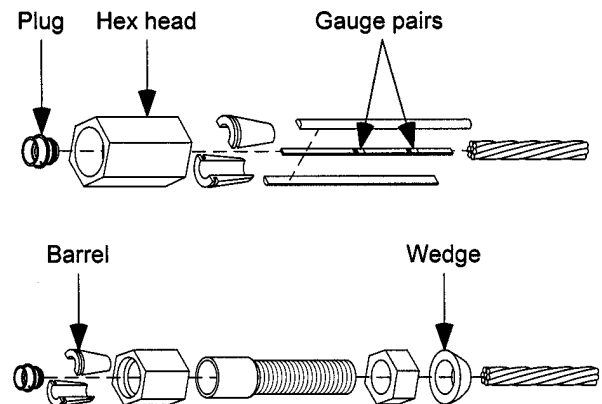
Instrumented cable bolt assembly with and without pretension head.
